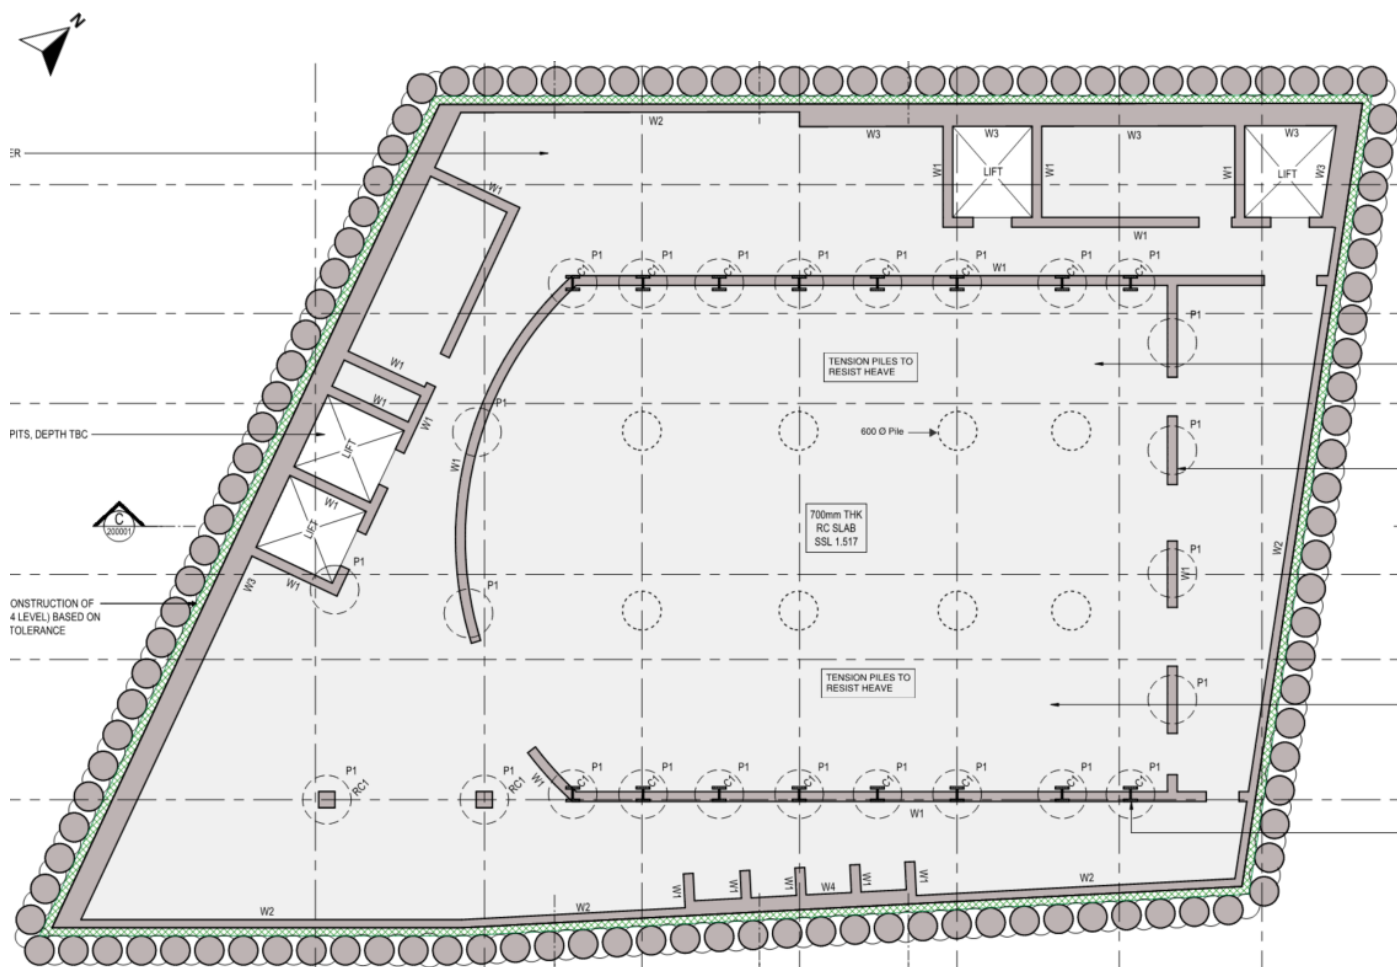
Proposed B4 level plan (source: 2111-EWP-ST-B4-DR-S-060000 WIP 21/05/2025)
